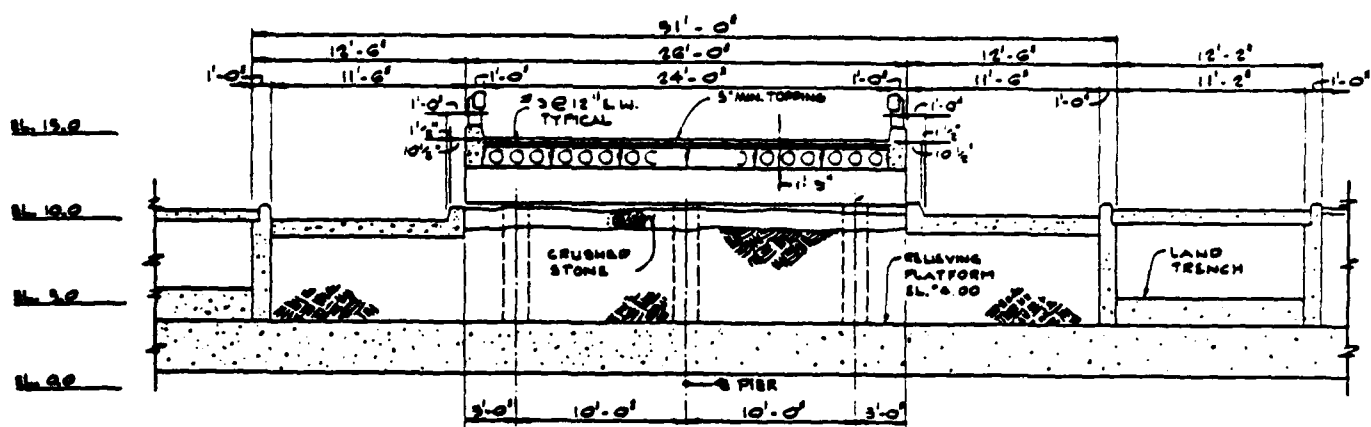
Cross Section, Pile-Supported Pier, General Area.
